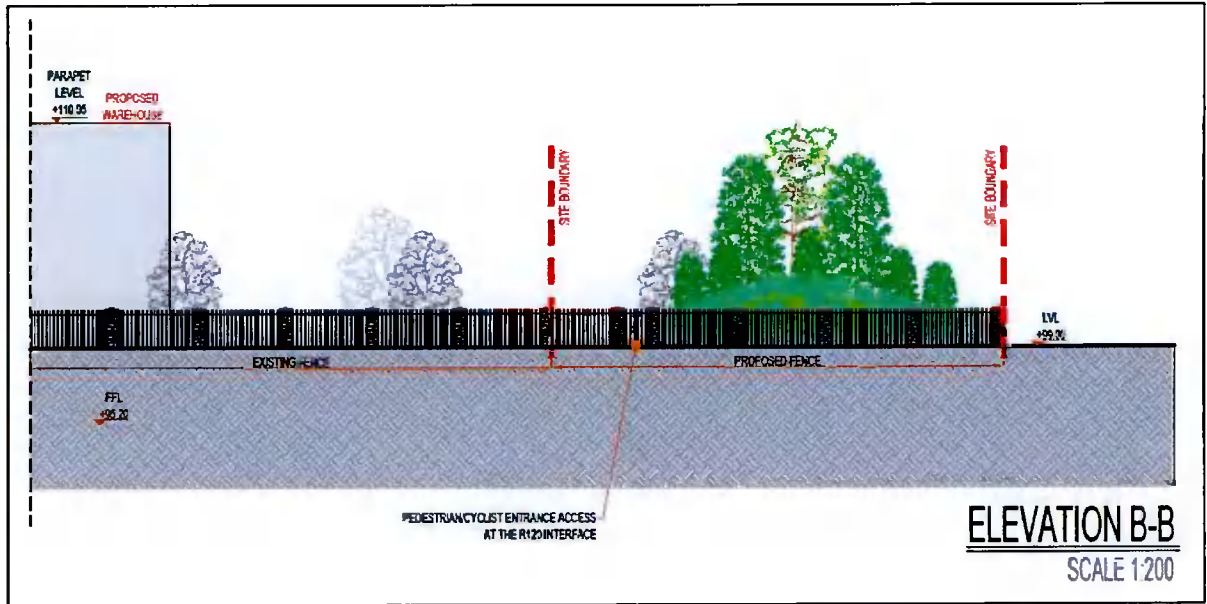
Elevation B-B (Drawing No.: D16g3 GA-A09 PL2)
